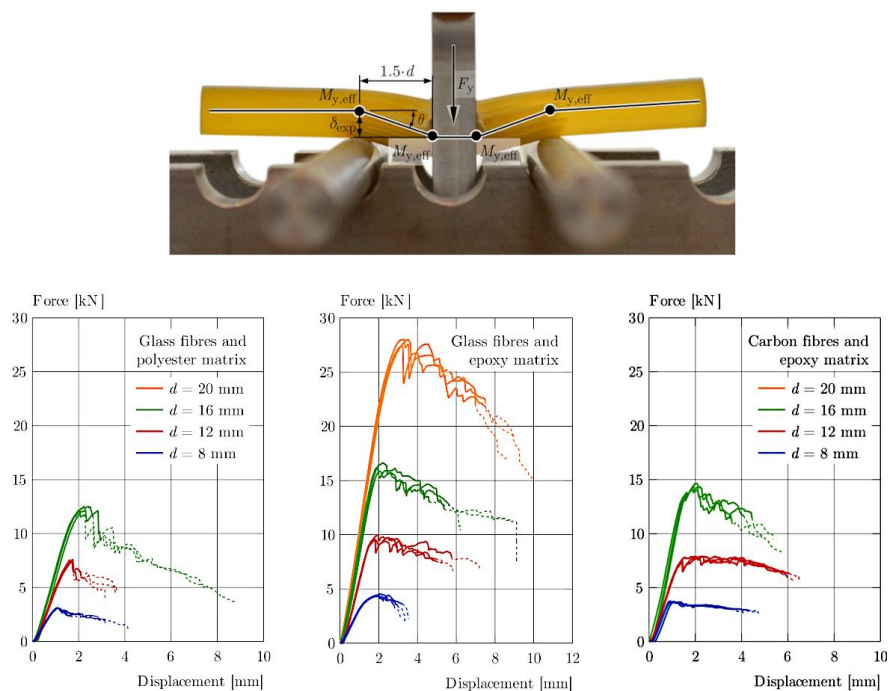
Test set-up (above) and force-displacement curves of the "apparent horizontal shear strength tests" on FRP rods (below) (Palma et al. (2016b)).
